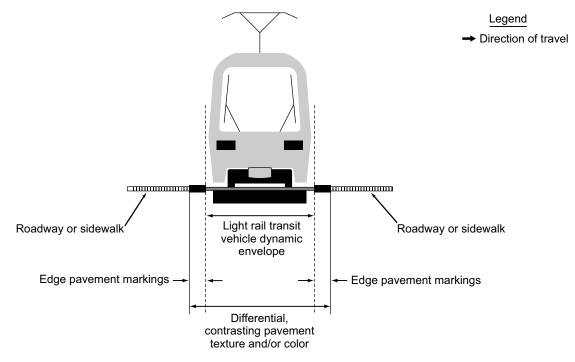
C-6. Examples of Highway-Light Rail Transit Grade Crossing Pavement Markings
